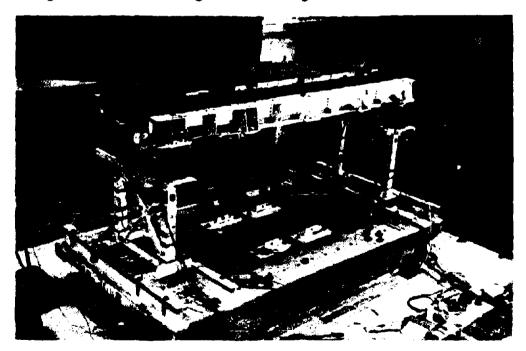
View of Bridge Model in Configuration with two Flexible Piers
